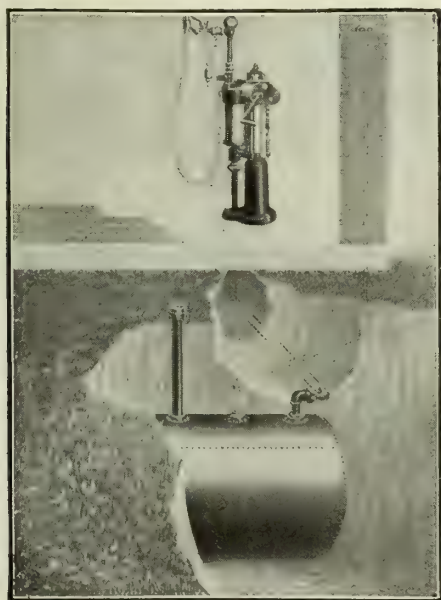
INDOOR GASOLINE PUMP, SHOWING METHOD OF CONNECTING UNDERGROUND TANK
